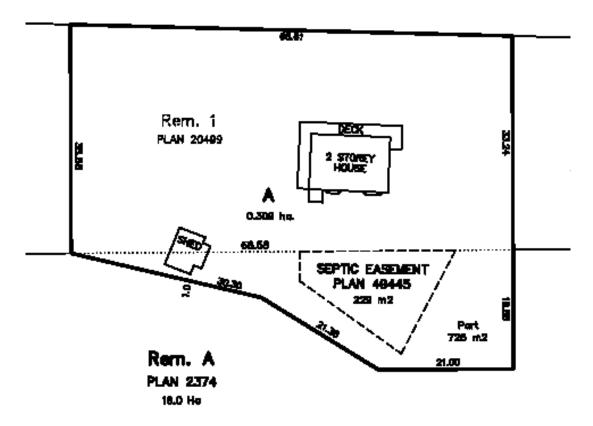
Site Plan of Lot 1 Illustrating the Southern 725 Square Metres Proposed to be Transferred from Lot A to Lot 1
